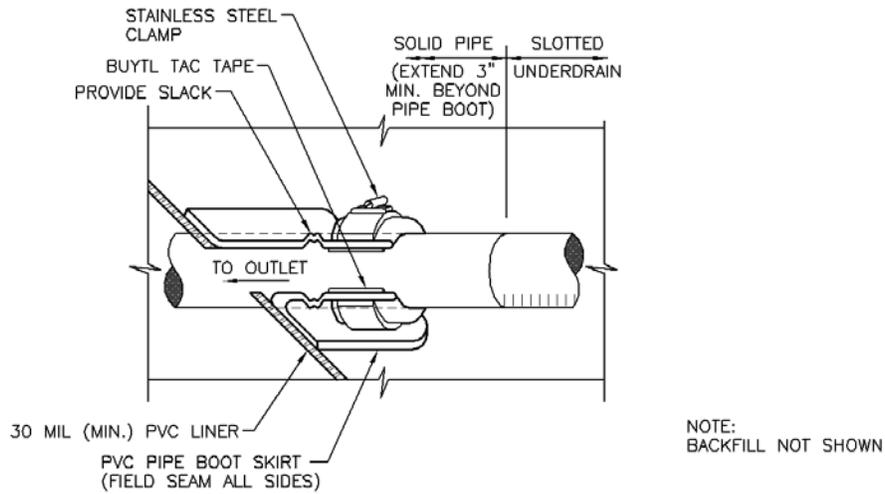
Geomembrane Liner/Underdrain Penetration Detail
